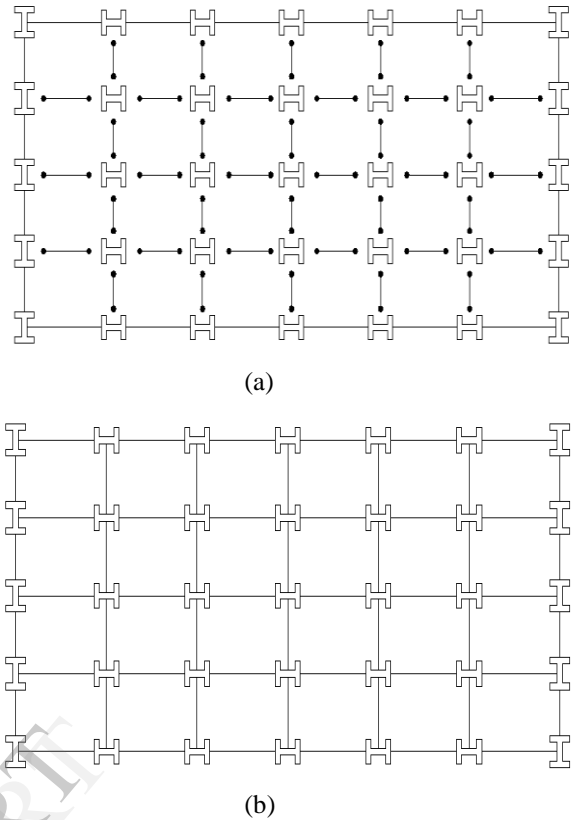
Connection type (a) pin connections joints (b) moment connection joints.
